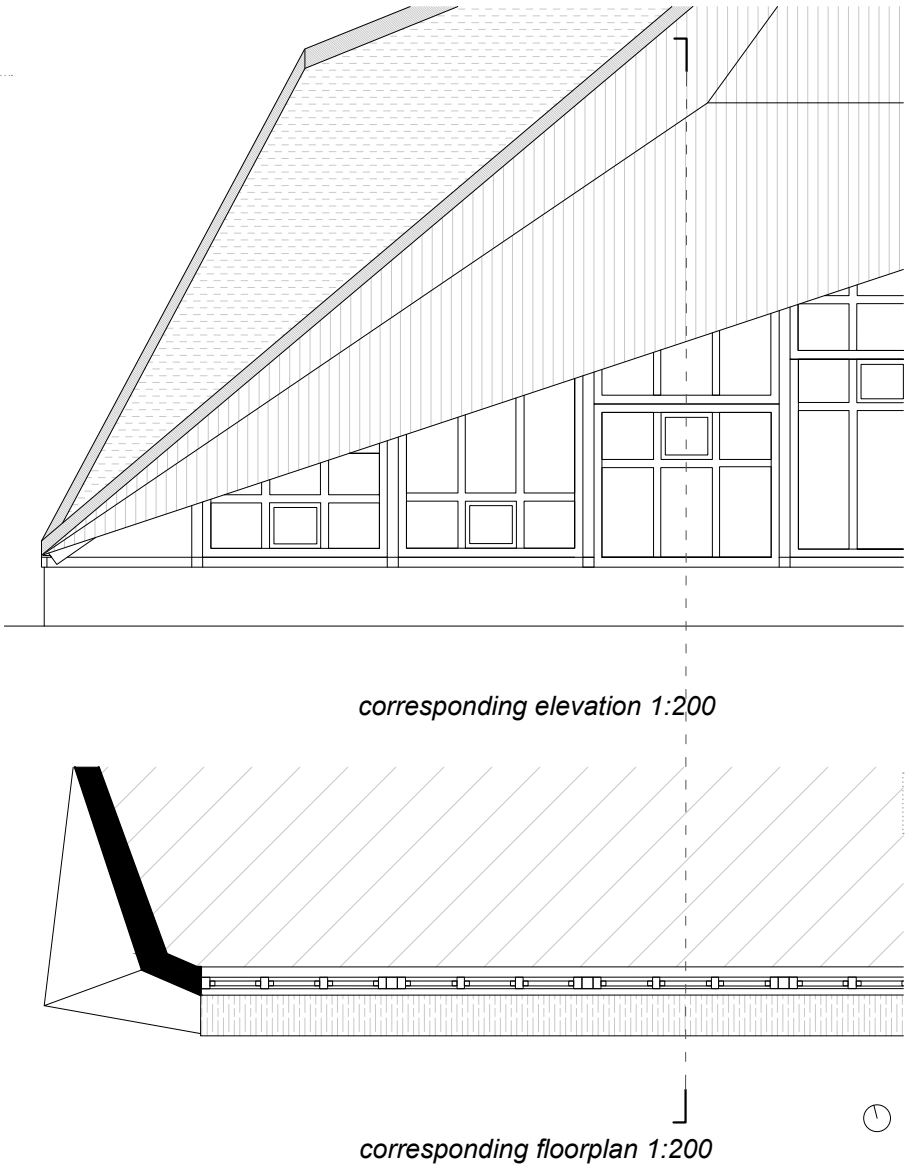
Detail, section and floorplan drawings, Superuse Studios | Edited by Richard Múdry, Annika Goedkoop, Sacha Oberski
